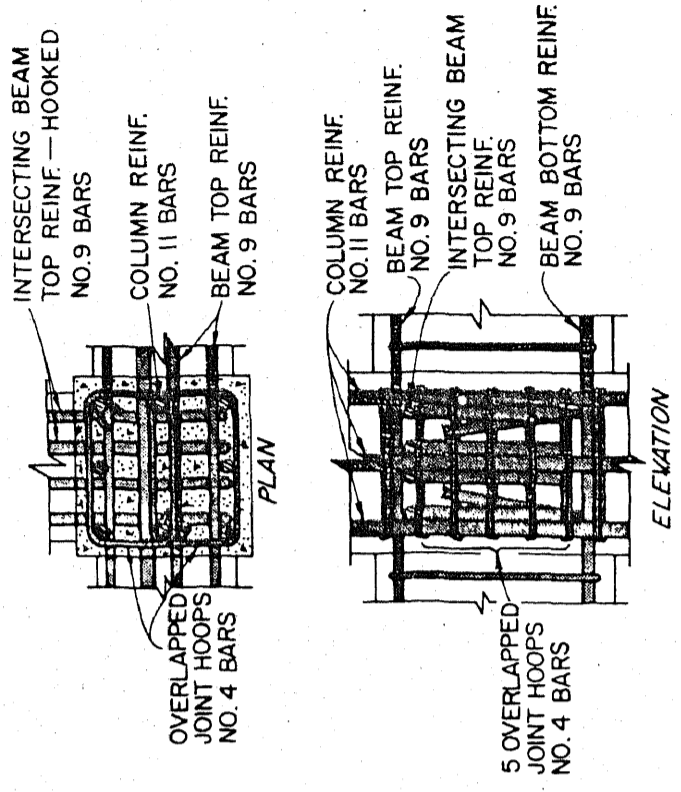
DETAIL OF REINFORCEMENT IN EDGE JOINT SPECIMEN
